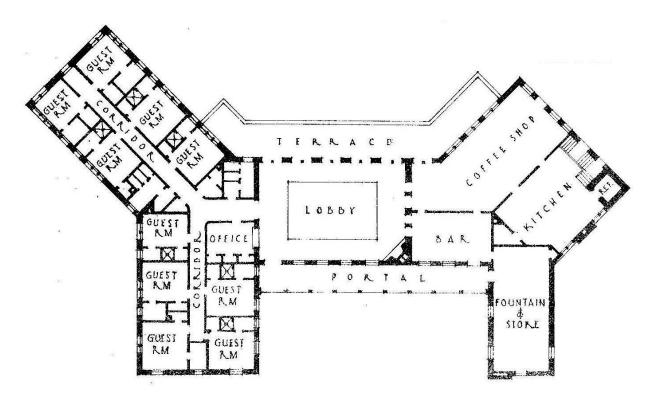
Original lodge floor plan, as depicted in Master Recreation Plan, Conchas Dam Project, Corps of Engineers, Albuquerque District, May 1947, Plate No. 10.
